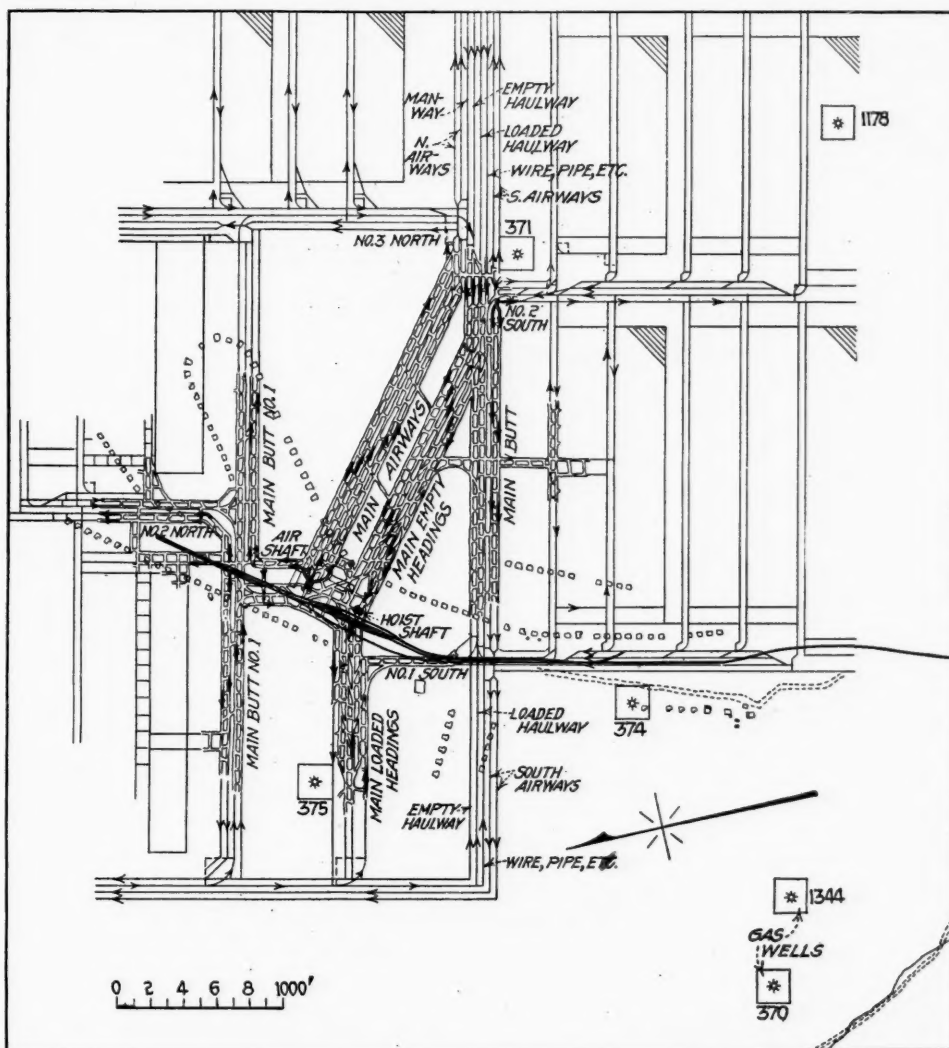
DEVELOPMENT AND LAYOUT OF NO. 87 MINE
